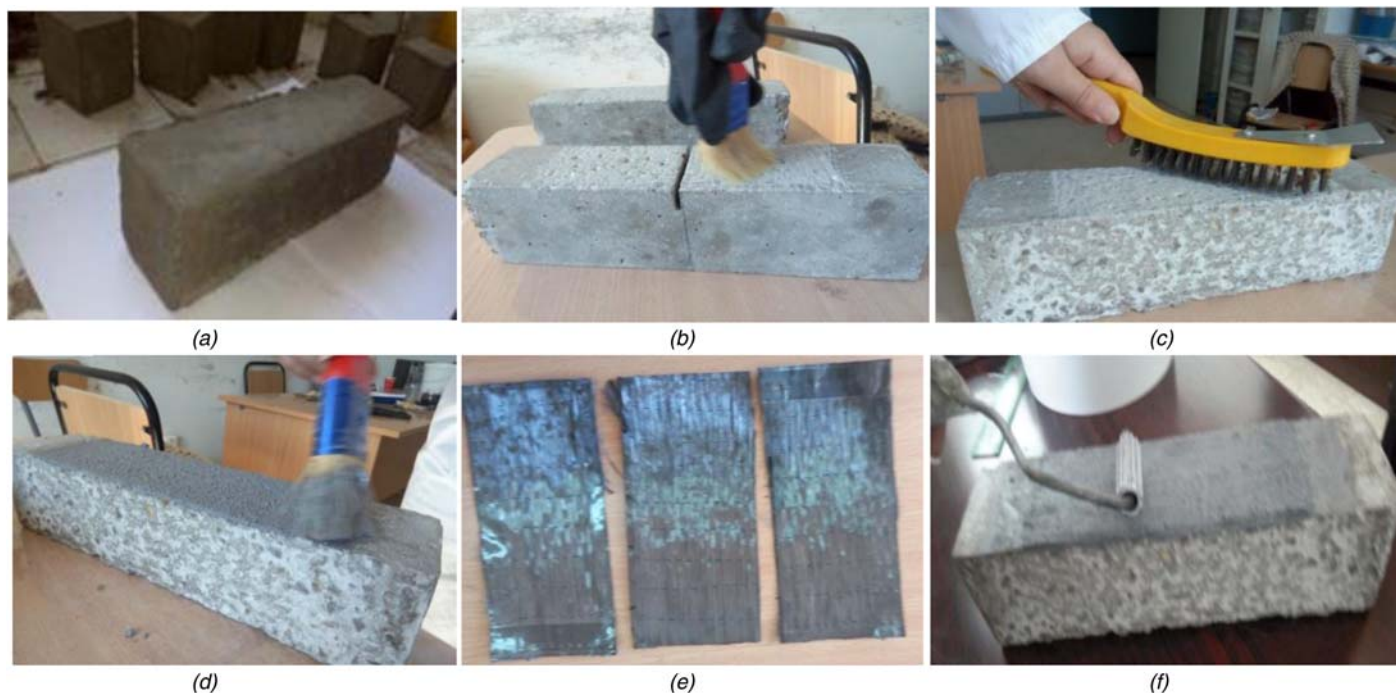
Specimen preparation: (a) concrete beam; (b) initial notch; (c) abraded beams; (d) application of adhesive layer; (e) CFRP cut; (f) application of flexible roller on the CFRP
